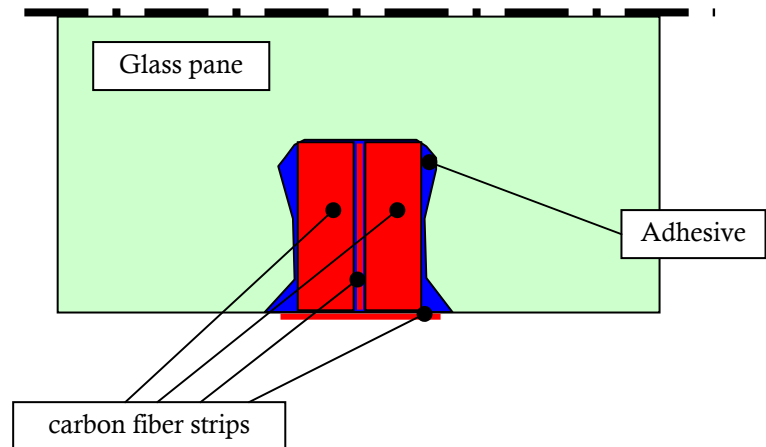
, Close-up of bottom of girder cross-section with reinforcement geometry for specimen 2.
